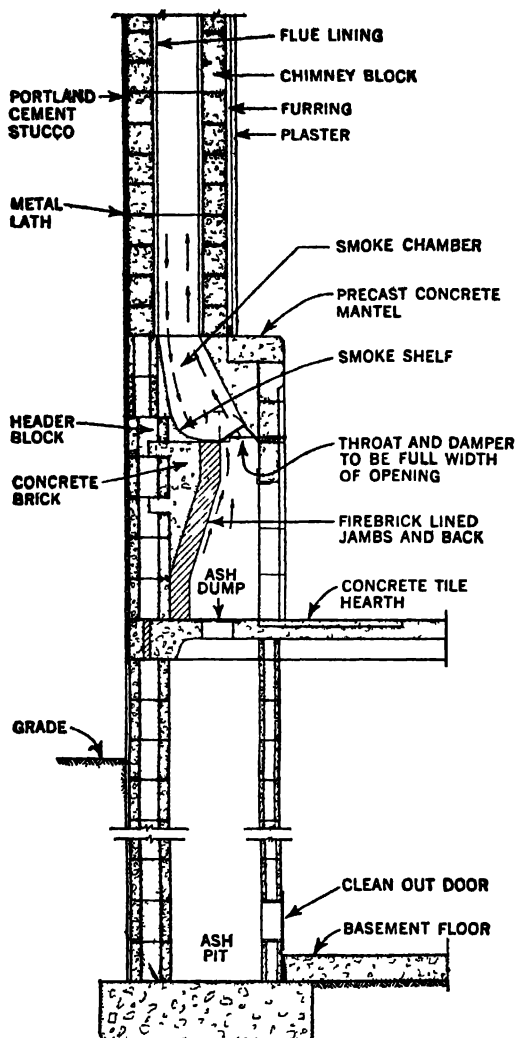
A.—Typical section through fireplace and ash pit using concrete masonry units.
